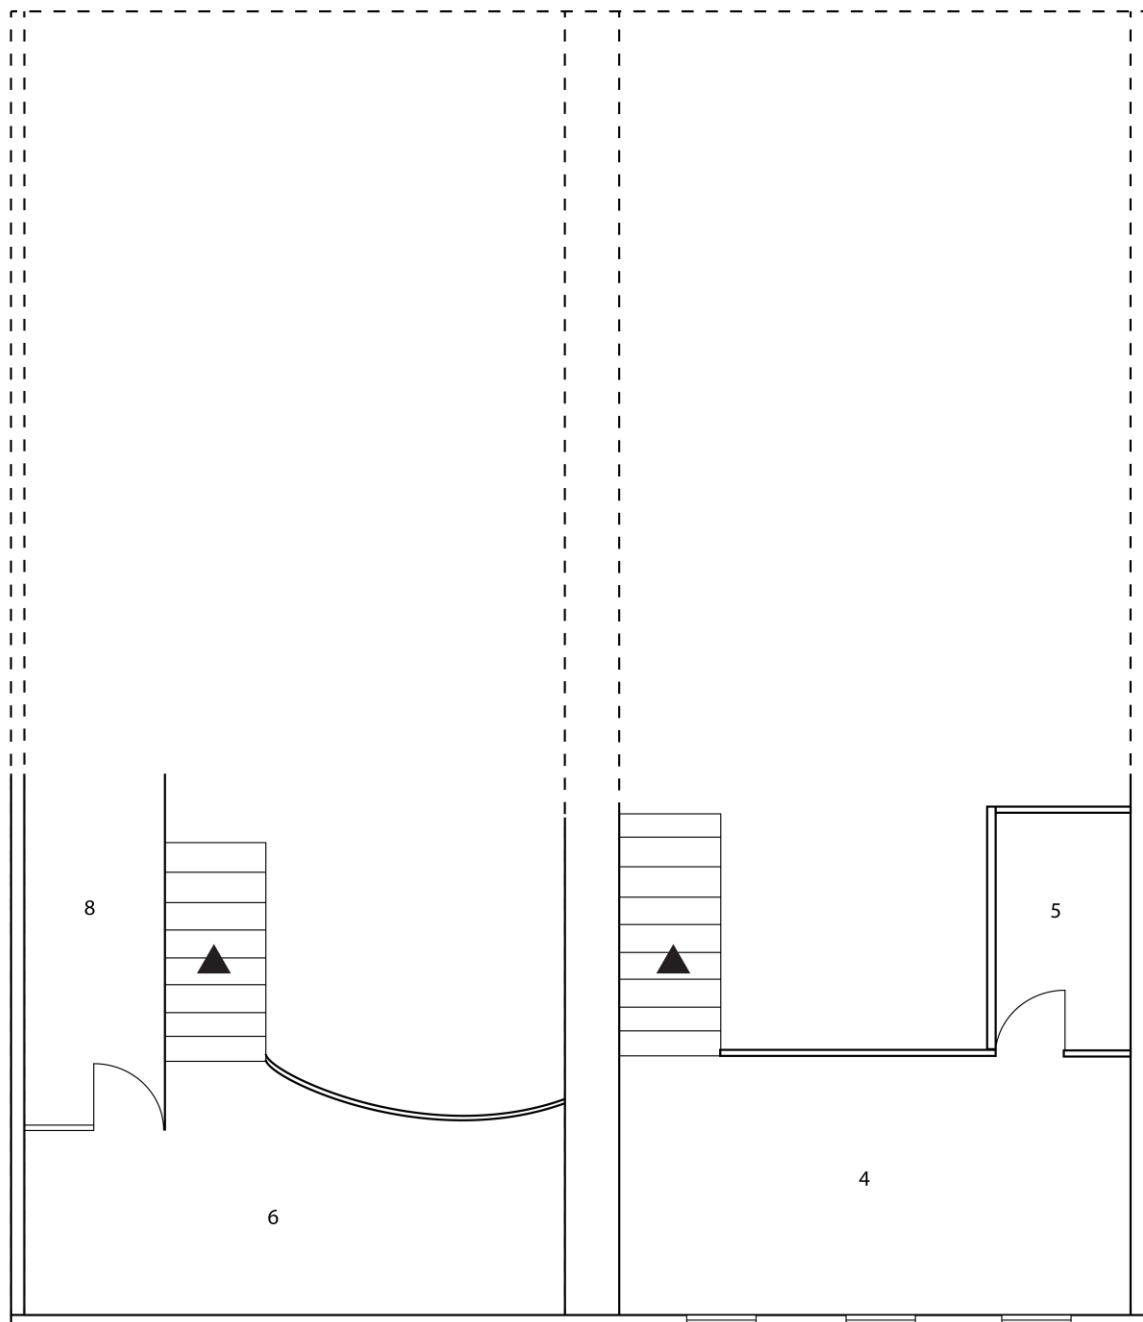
Mezzanine floor plan of Coxhead's Building.
